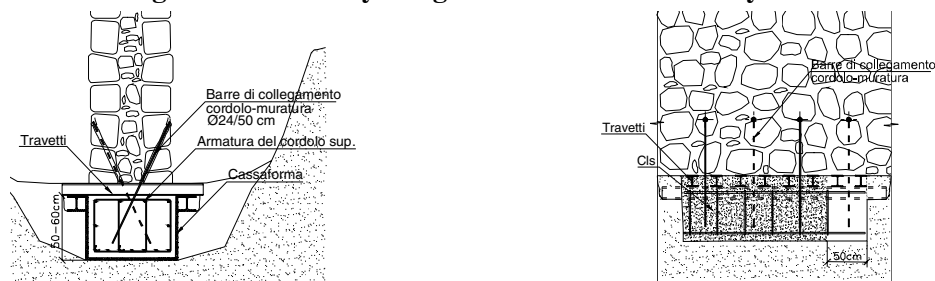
Excavation for the string-course casting and laying of the r. c. reinforcing bars
